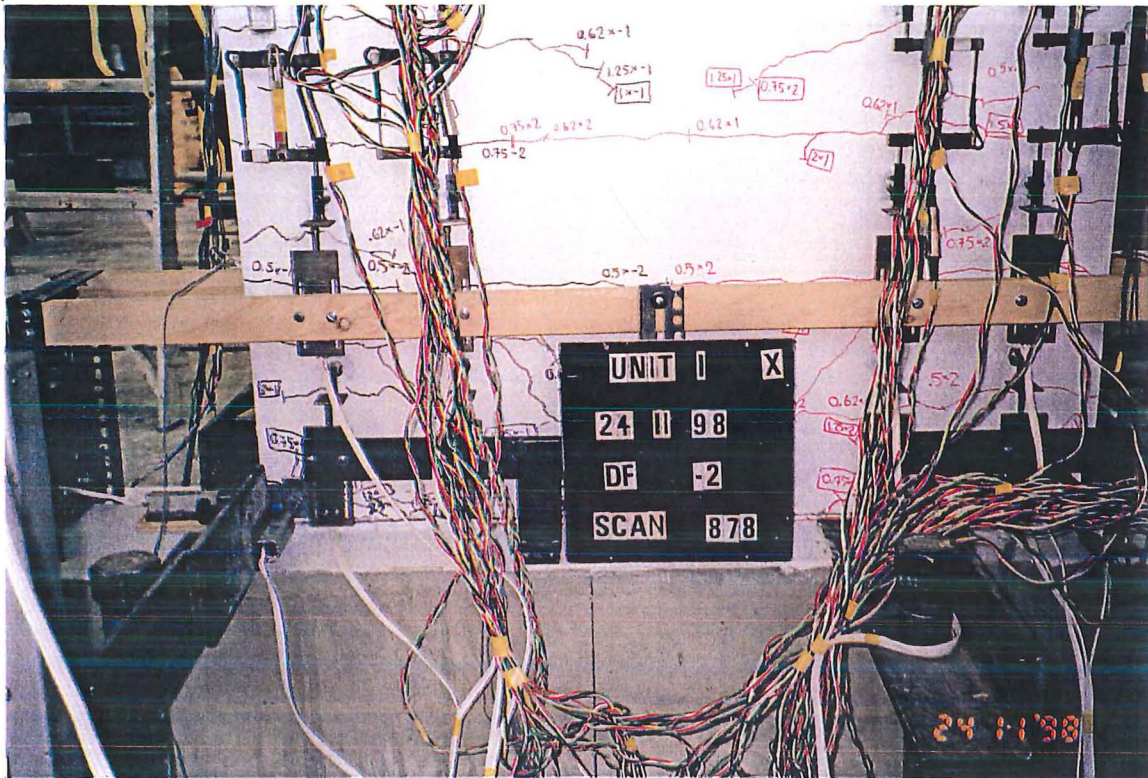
Unit 1: Crushing and spalling of concrete at $\mu_A = -2 \times 1$ (South/Concave)
